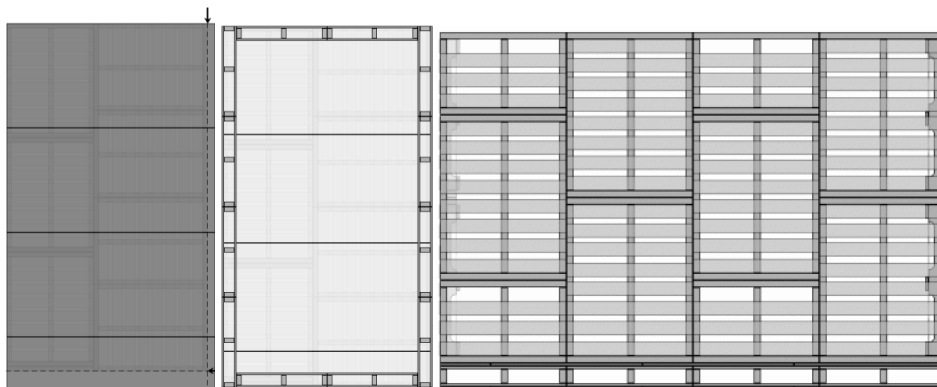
Step 2 & 3 in a pallet house (<http://www.tinypallethouse.com>).
